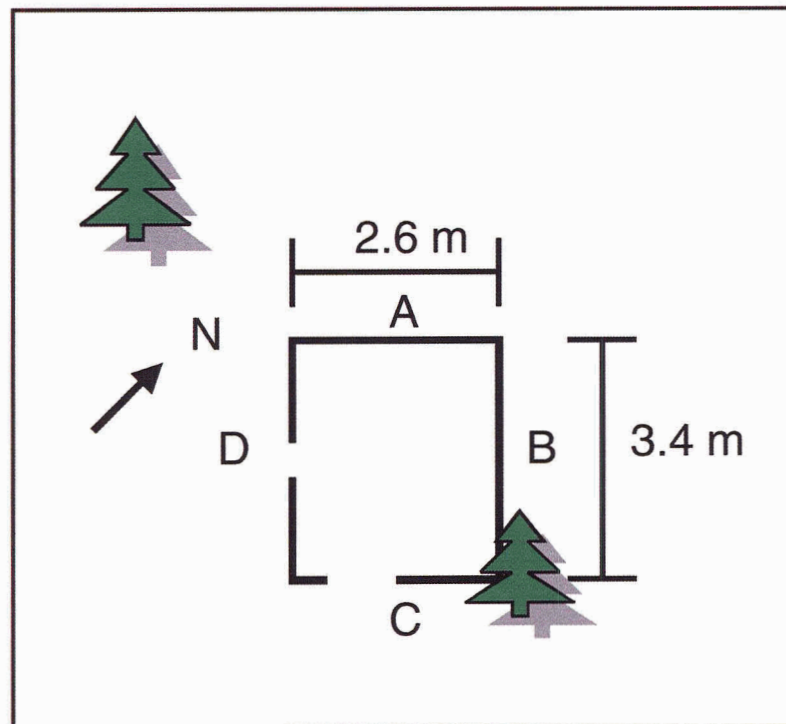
Glacier Lake Cabin dimensional drawing.
